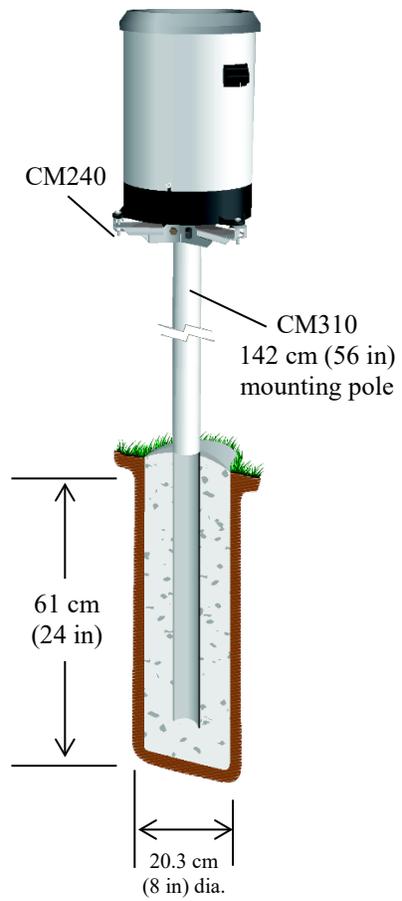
Rain Gage Installation (pole embedded in concrete)
